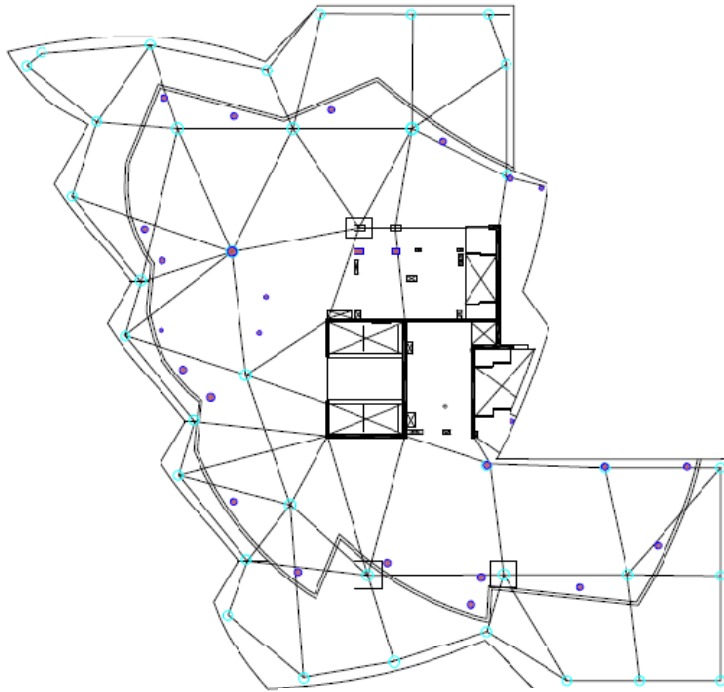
Sixth Floor Plan (note: very similar column layout to seventh through tenth floors)
